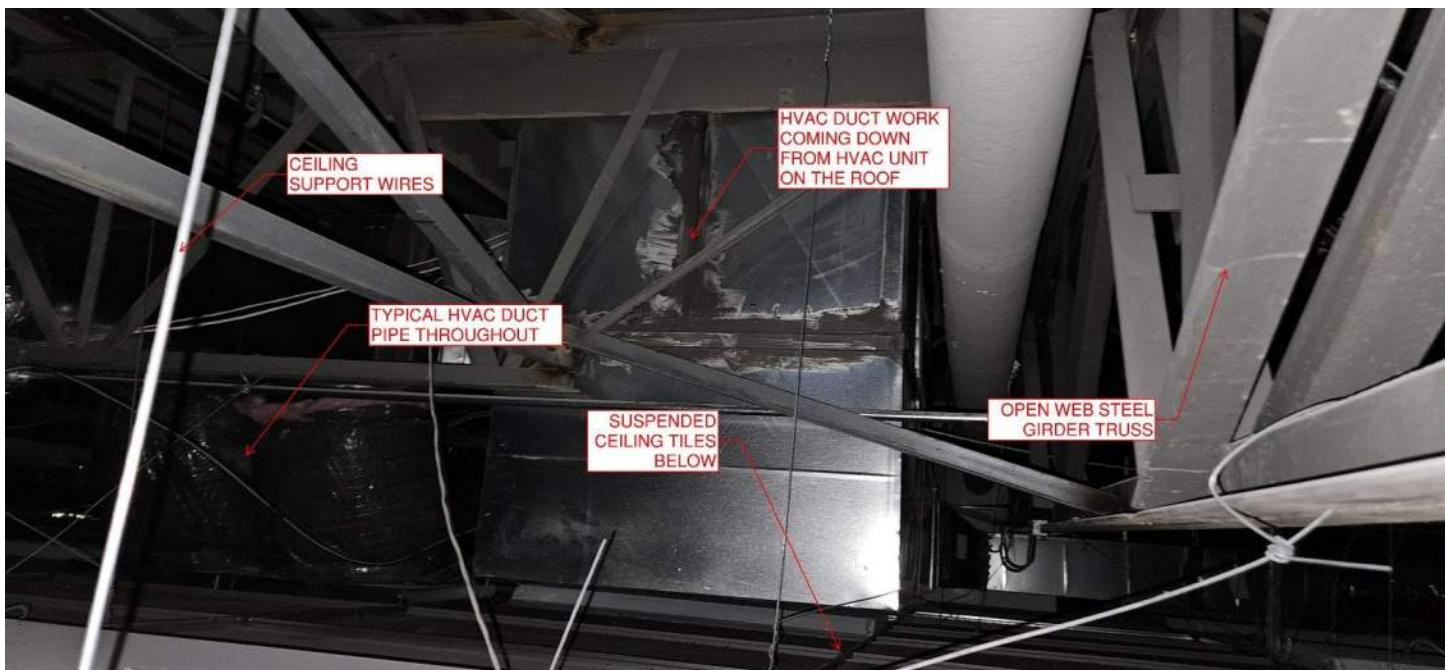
HVAC DUCTWORK BELOW MECHANICAL UNIT ABOVE
